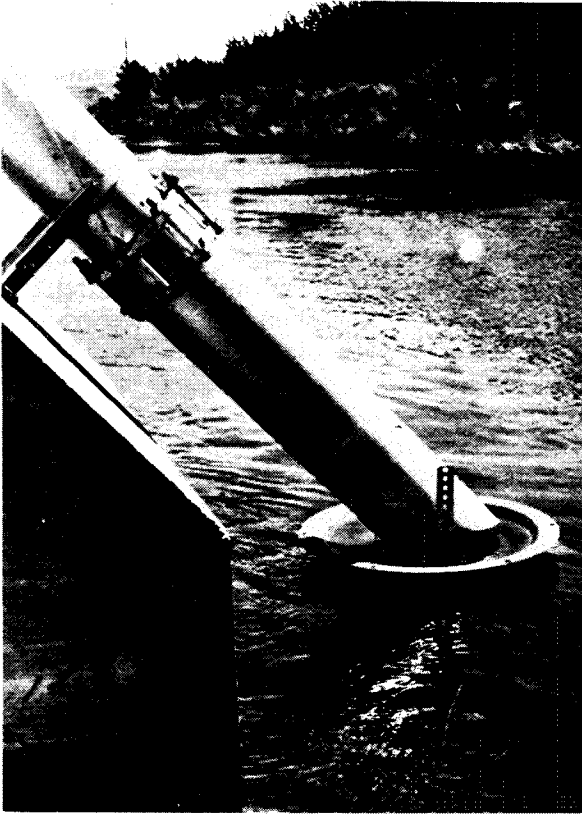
Siphon spillway with siphon breaker pan in place. P-17-D-62107
